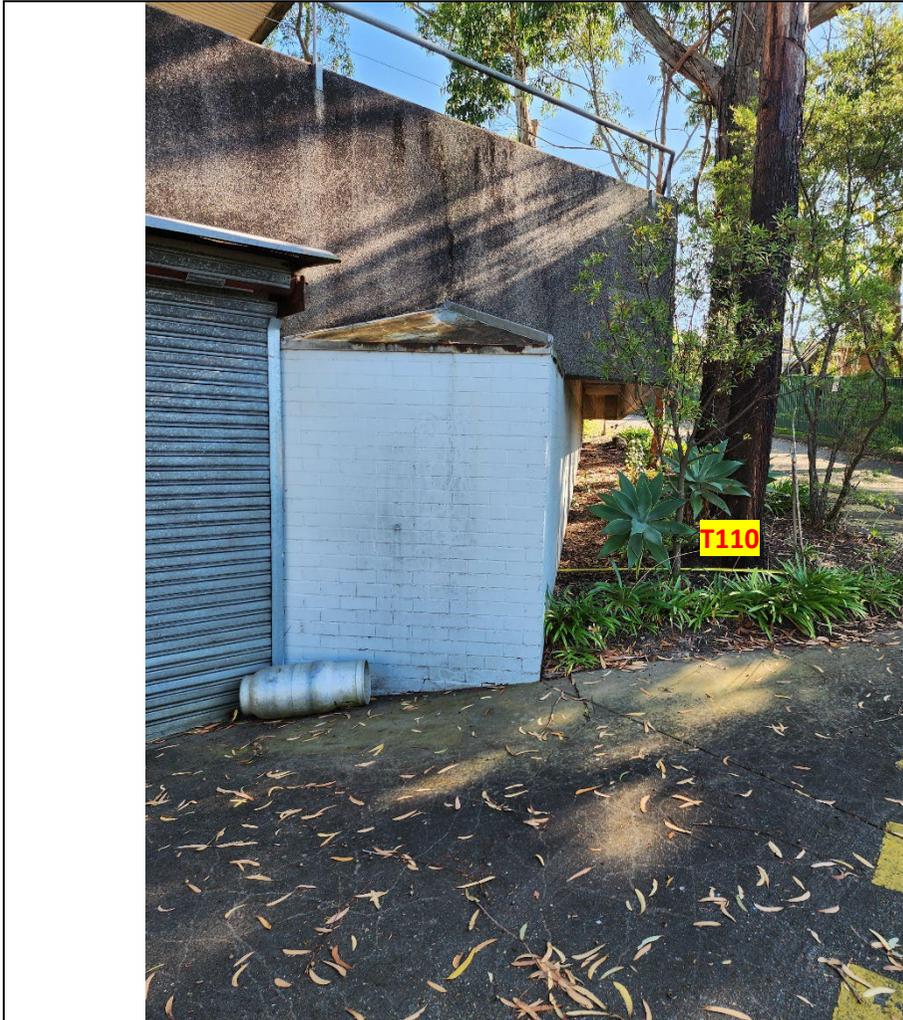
Trees 107 – 110 within 2m of existing building and are exempt under the DCP.
